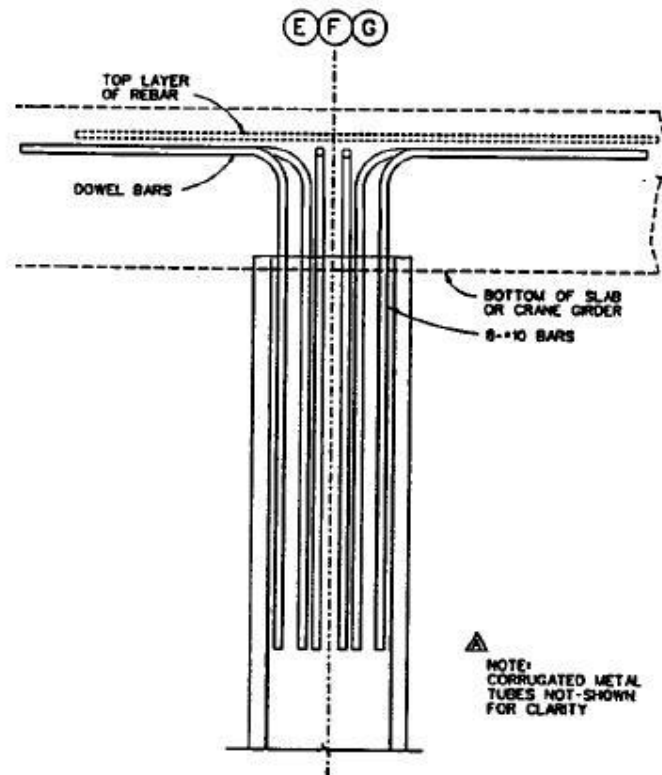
Typical prestressed concrete pile moment connections with outward bent dowel connection (Roader, 2002)
